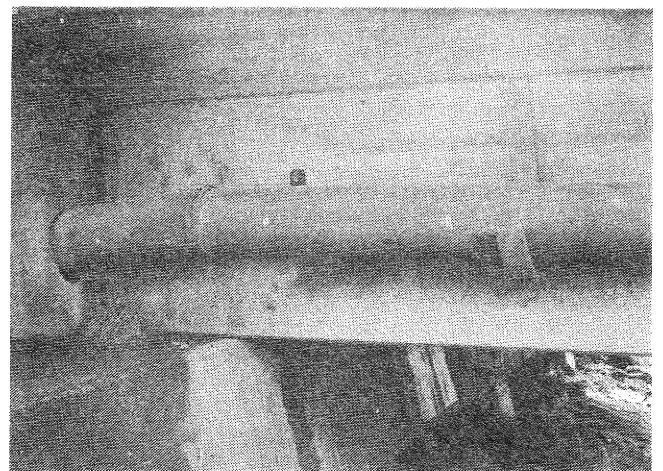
Pipeline under Landing Road Bridge
